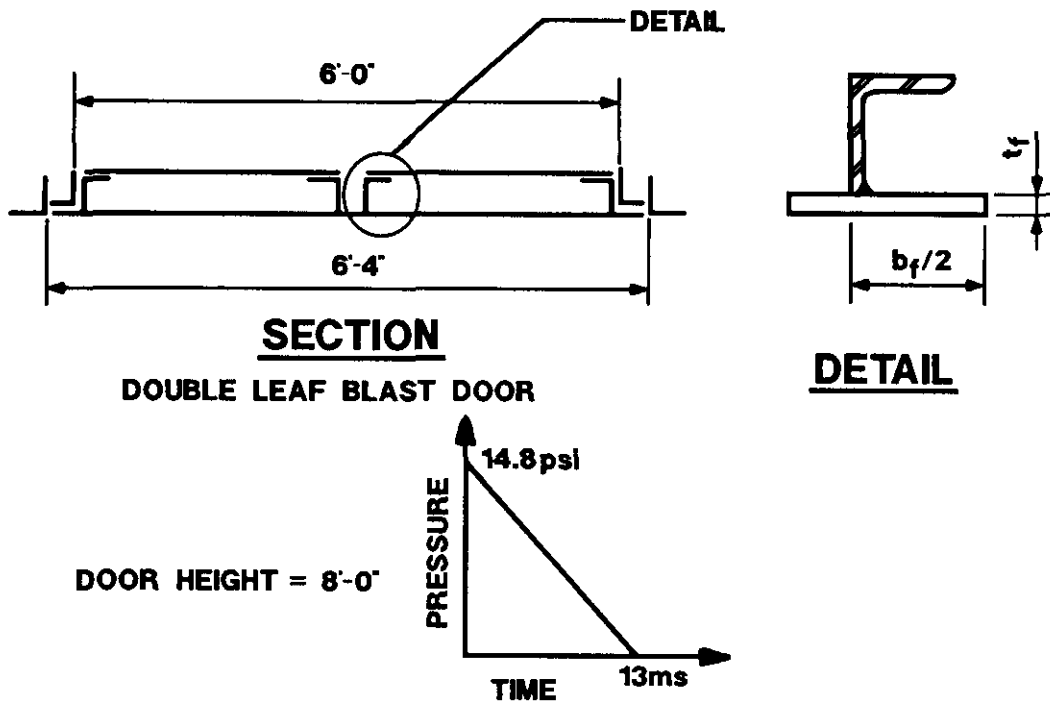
A-7(a) Door configuration and loading, Example 5A-7(a)
